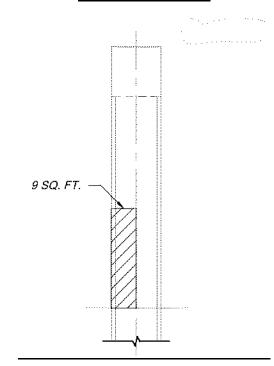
Location of Proposed Concrete Repairs - Pier 1 View A-A MP 182.1
